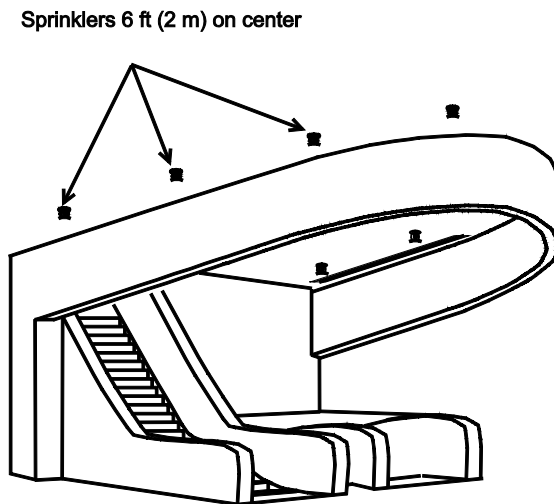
Draft Curtains And Sprinklers Around Escalator Openings.
